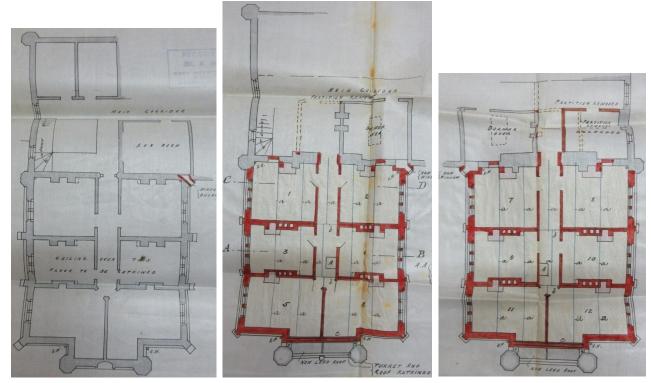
(left): Existing second floor plan – south wing, 1903. Figure 43 (centre): Proposed third floor plan – south wing, 1903. Figure 44 (right): Proposed third floor plan – north wing, 1903.
